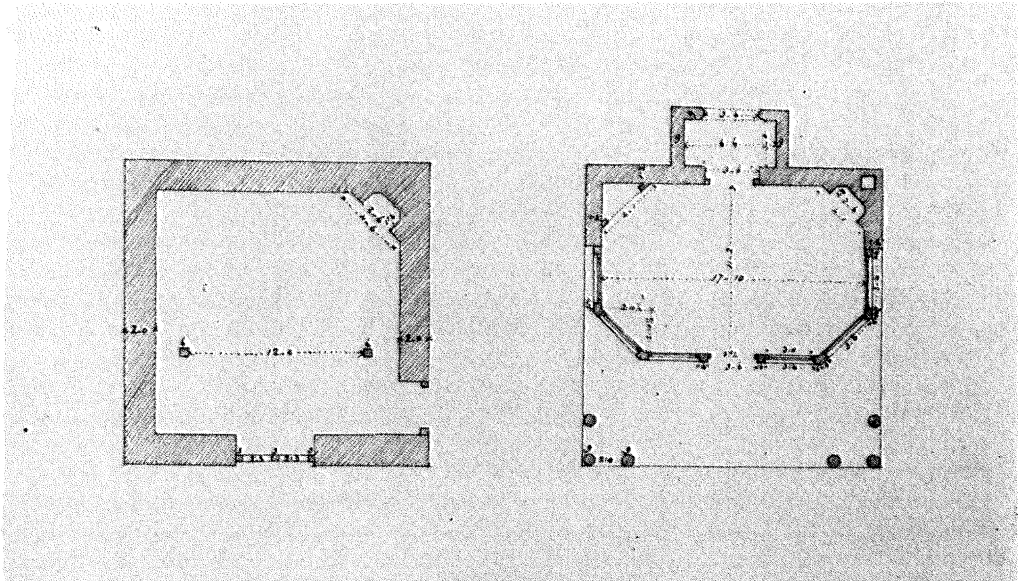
Ground plan and plan of upper floor of a gazebo or summer house for George Ward. George Repton. Museums, Art Gallery and Royal Pavilion, Brighton.
